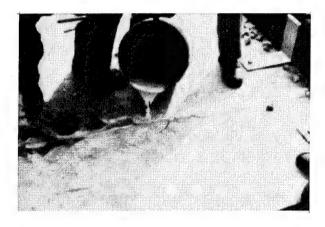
Sand-epoxy grout was used to fill traverse joints between the slabs on the Santa Fe Railroad redecking (from Hyma 1979)
